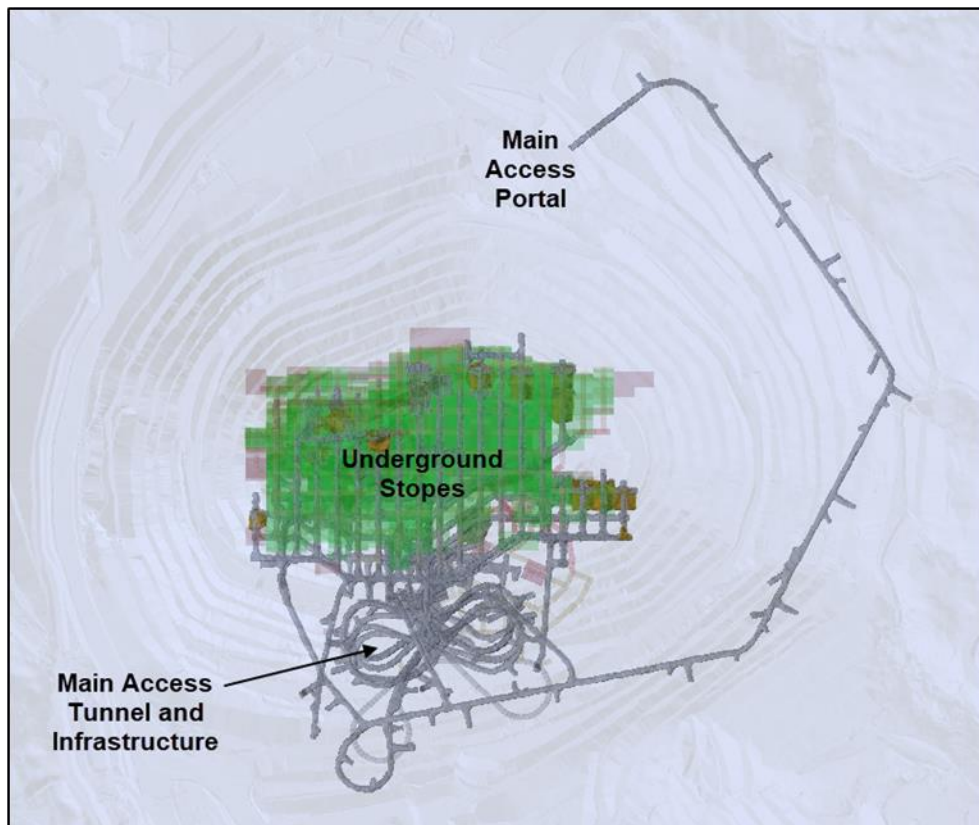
Underground Access and Designs with Final Pit - Plan View
